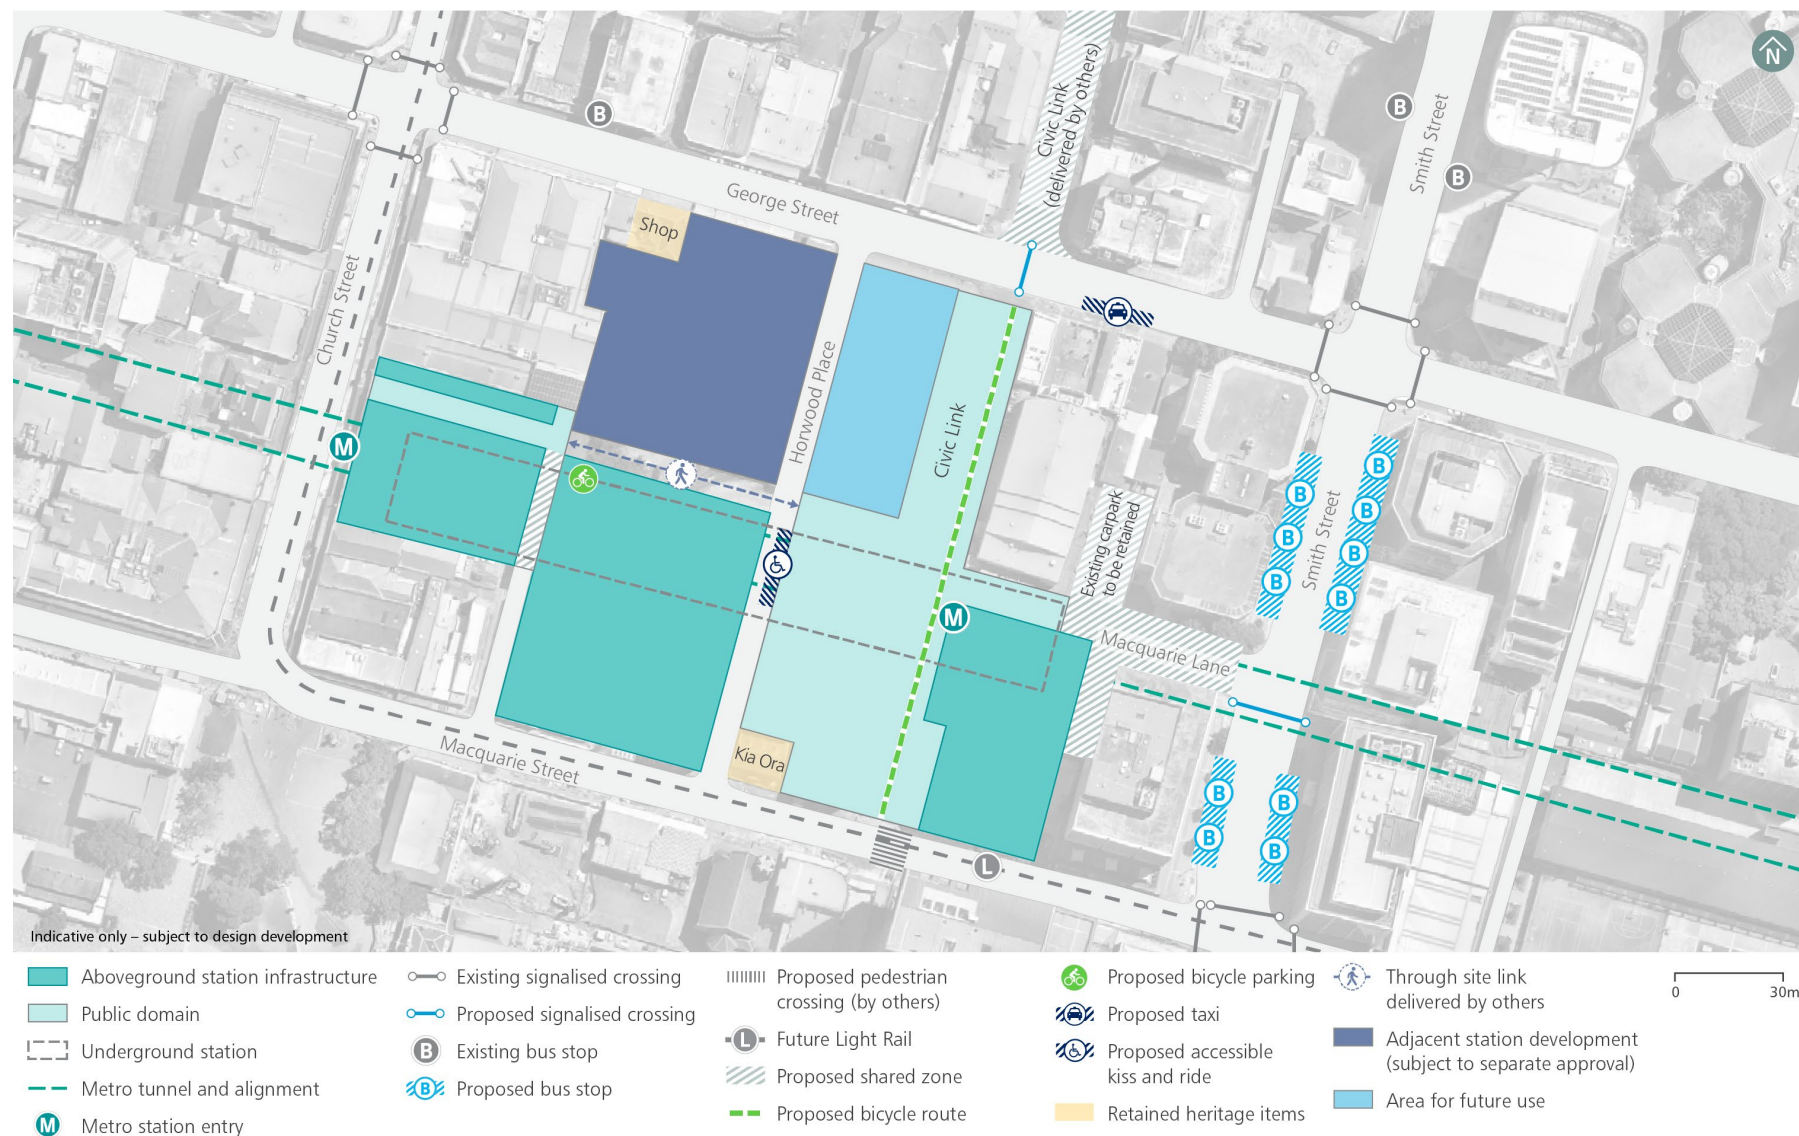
Indicative layout and key design elements – Parramatta metro station
